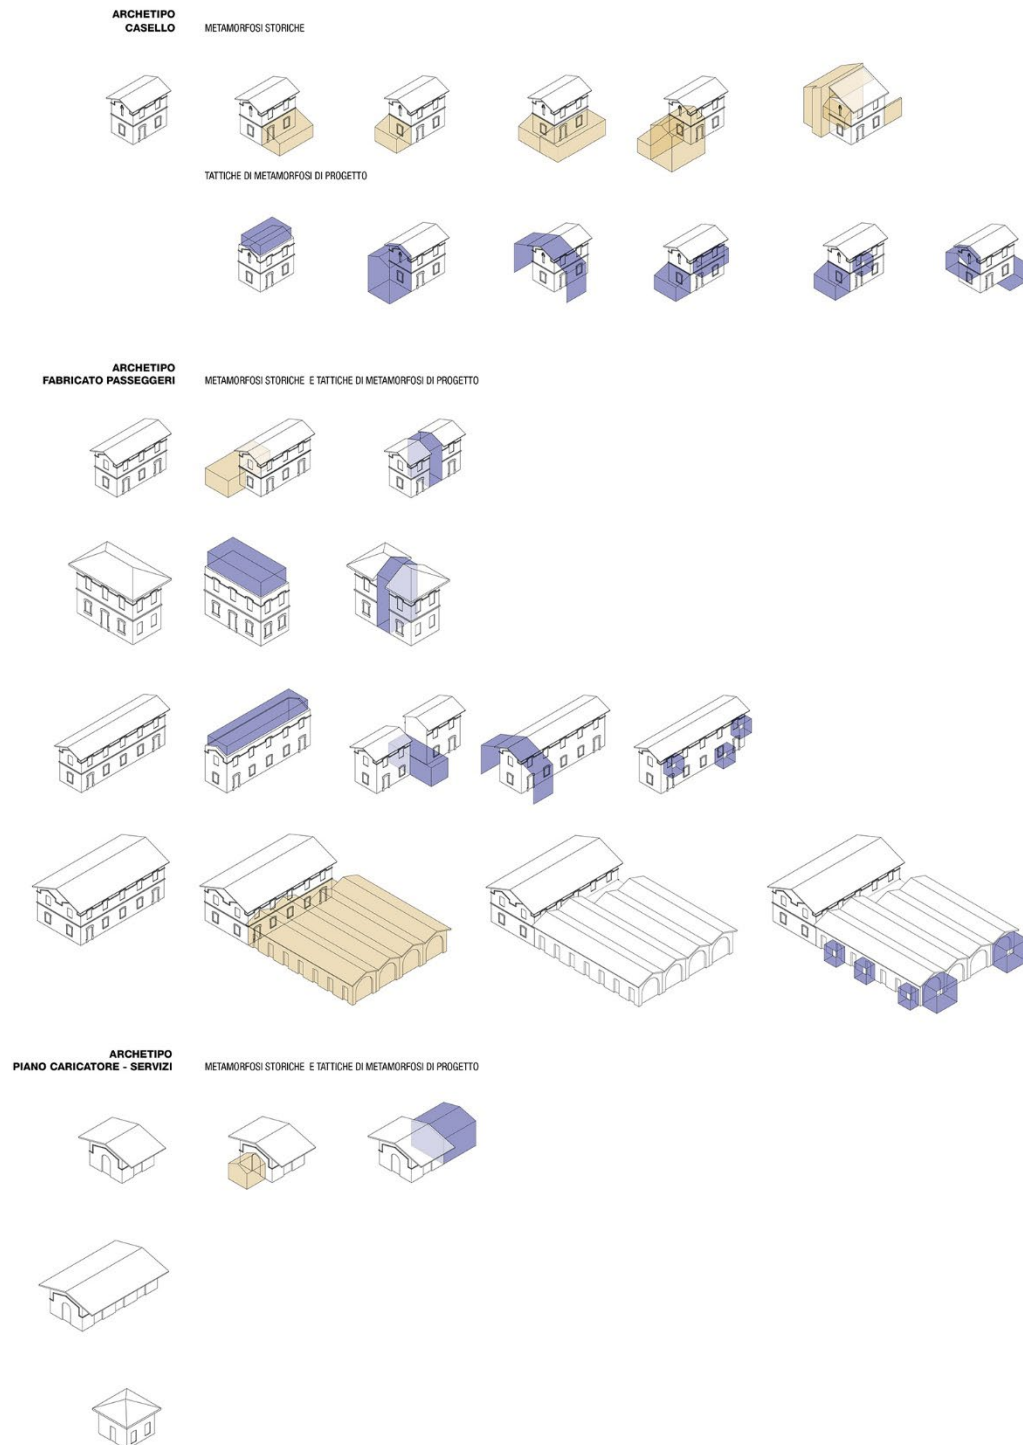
Archetypes of Tollbooths, Passenger Buildings, Loader Plan, Warehouse and Service, Built from 1904 to 1909
